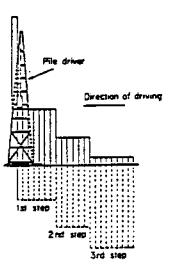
Driving sheet piles in panels (Teng, 1962, p. 378)
